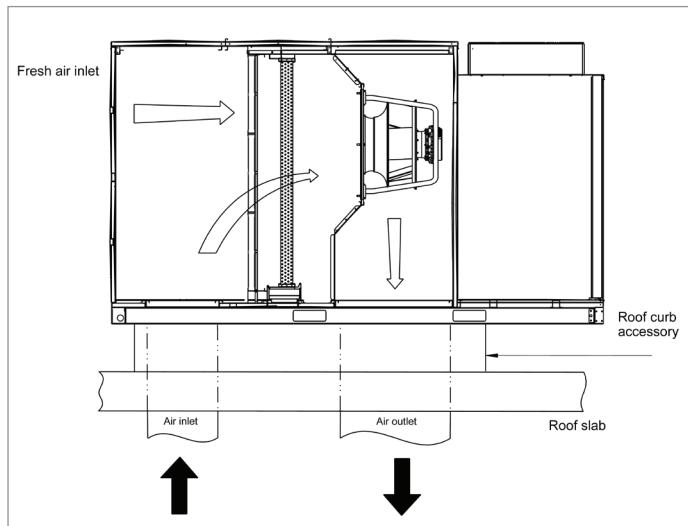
Roofcurb accessory – standard vertical supply and return
